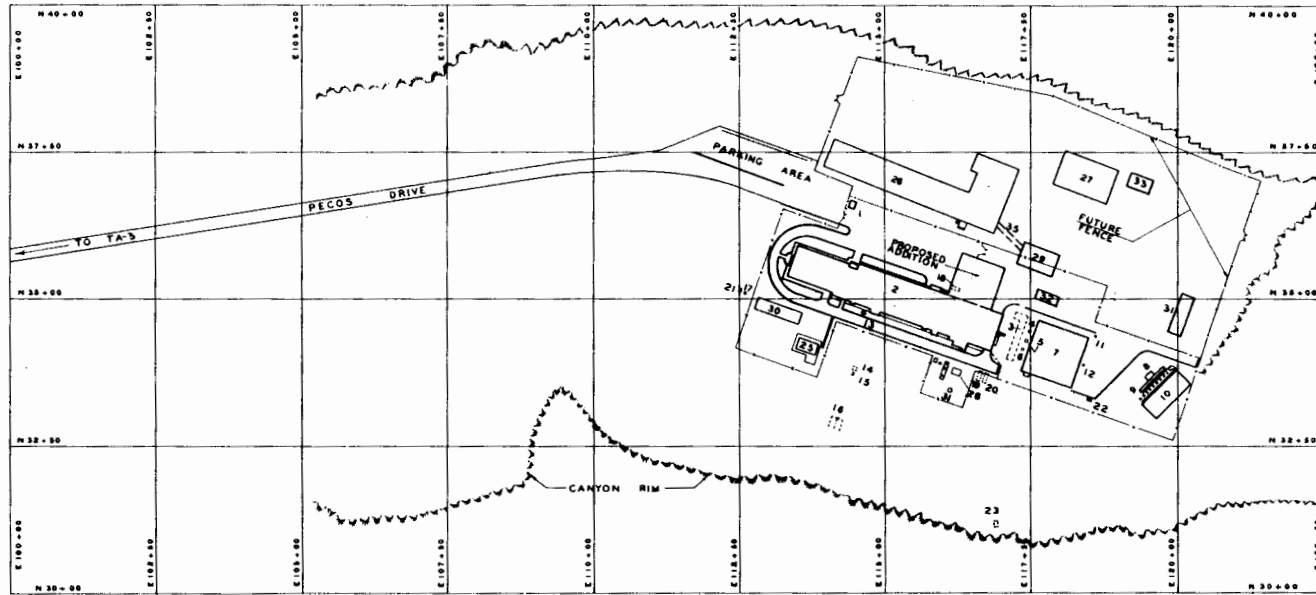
Structure Location Plan for TA-35 - Ten Site
